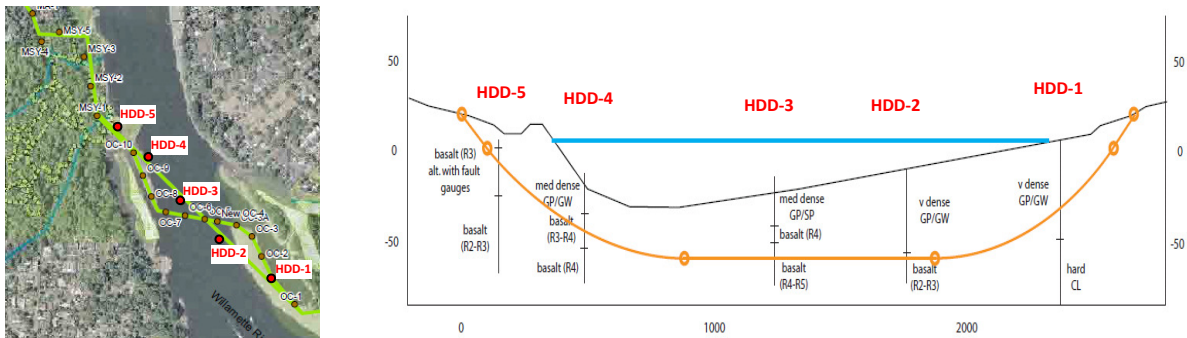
, b: Geotechnical Investigation; Geotechnical Cross Section
